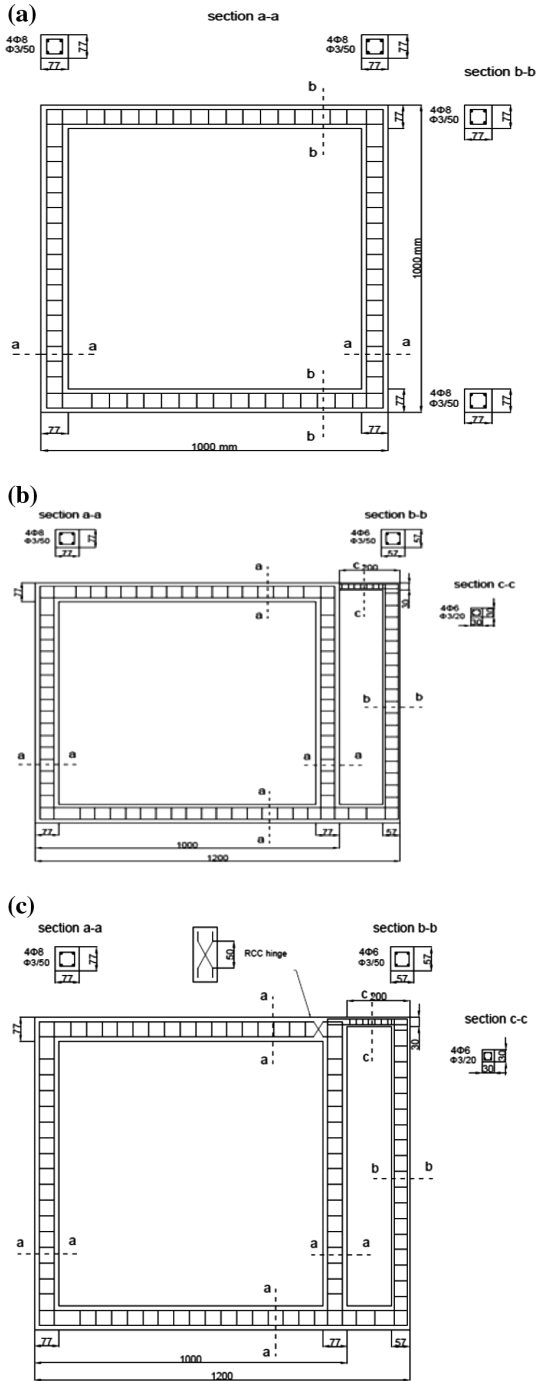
a. Reinforcement details of normal frame. b. Reinforcement details of rigid linked column frame. c. Reinforcement details of hinged linked column frame
